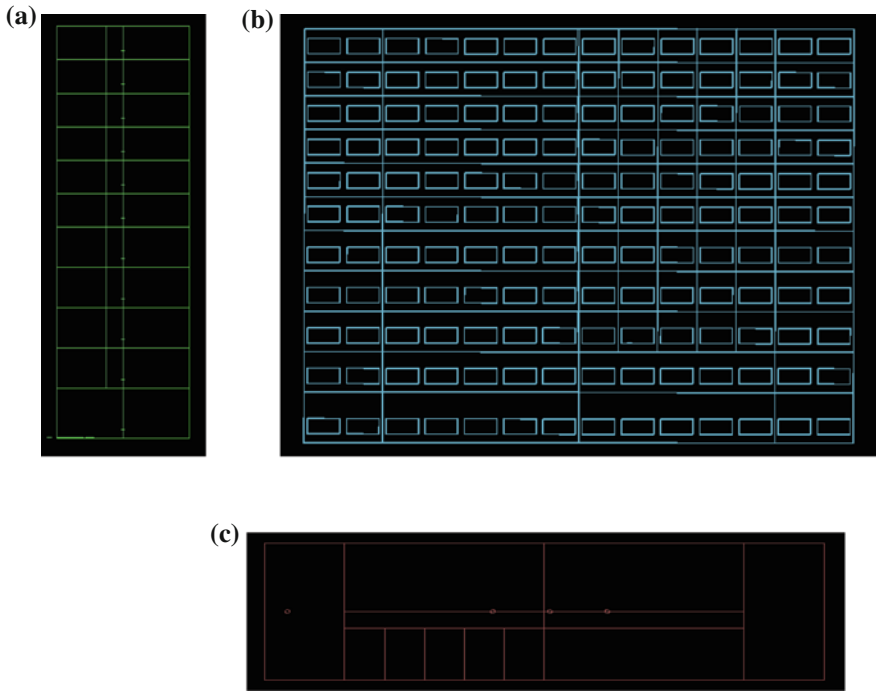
Simulated building. a Right side view. b Elevation. c Plan
